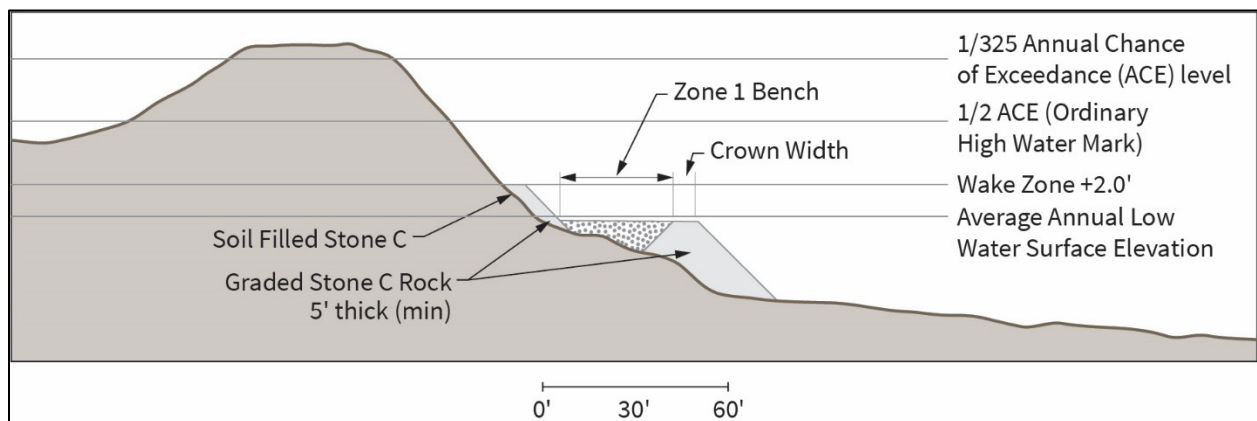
Typical Improvement Incorporating a Riparian Planting Bench
